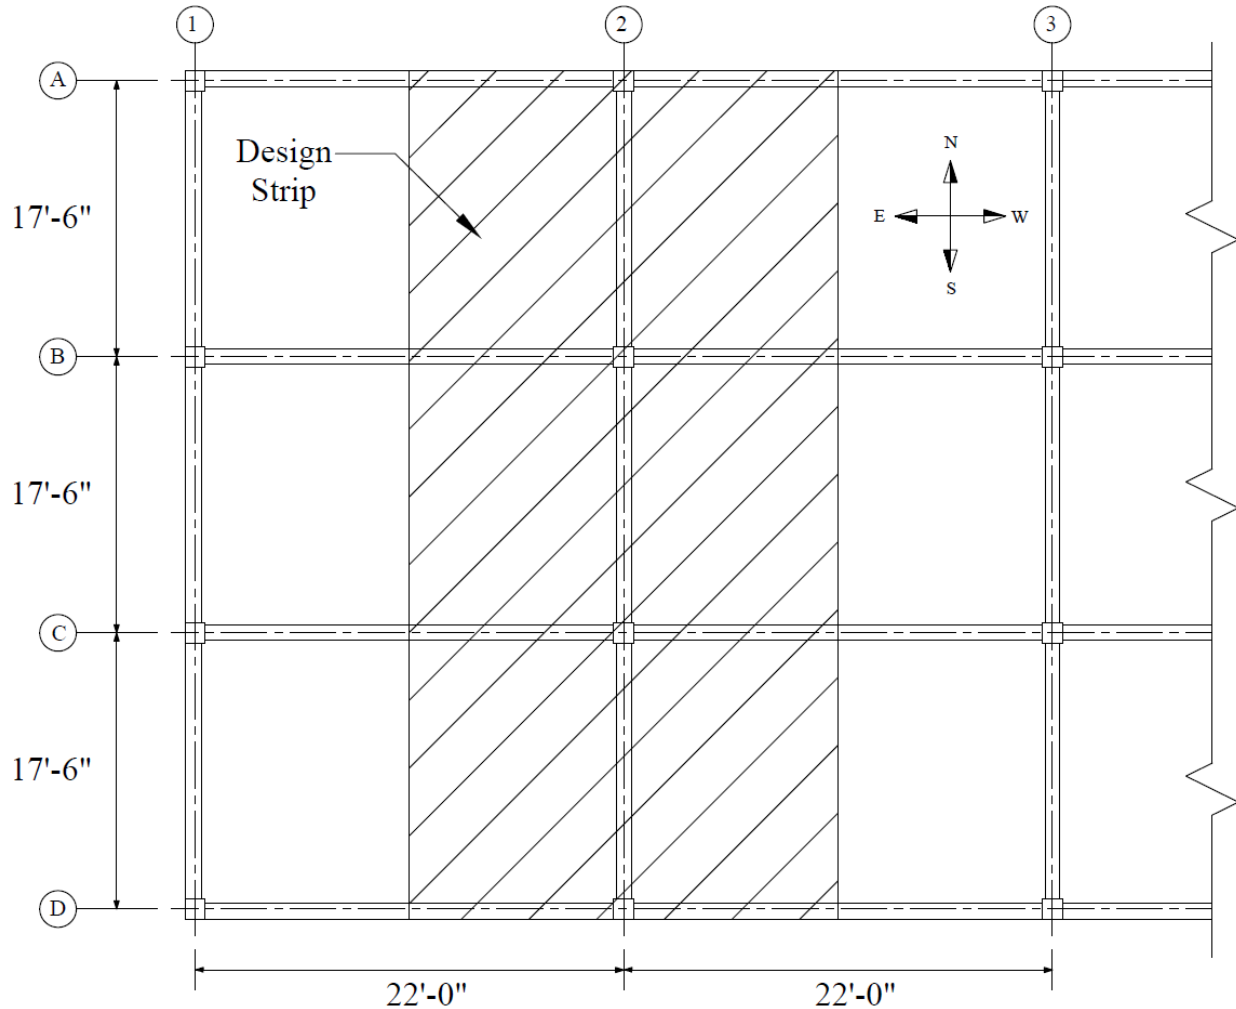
Two-Way Slab with Beams Spanning between all Supports
